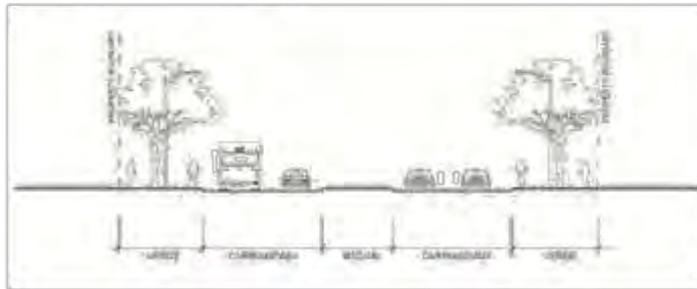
Indicative Layout of a Four Lane Sub-Arterial Road
